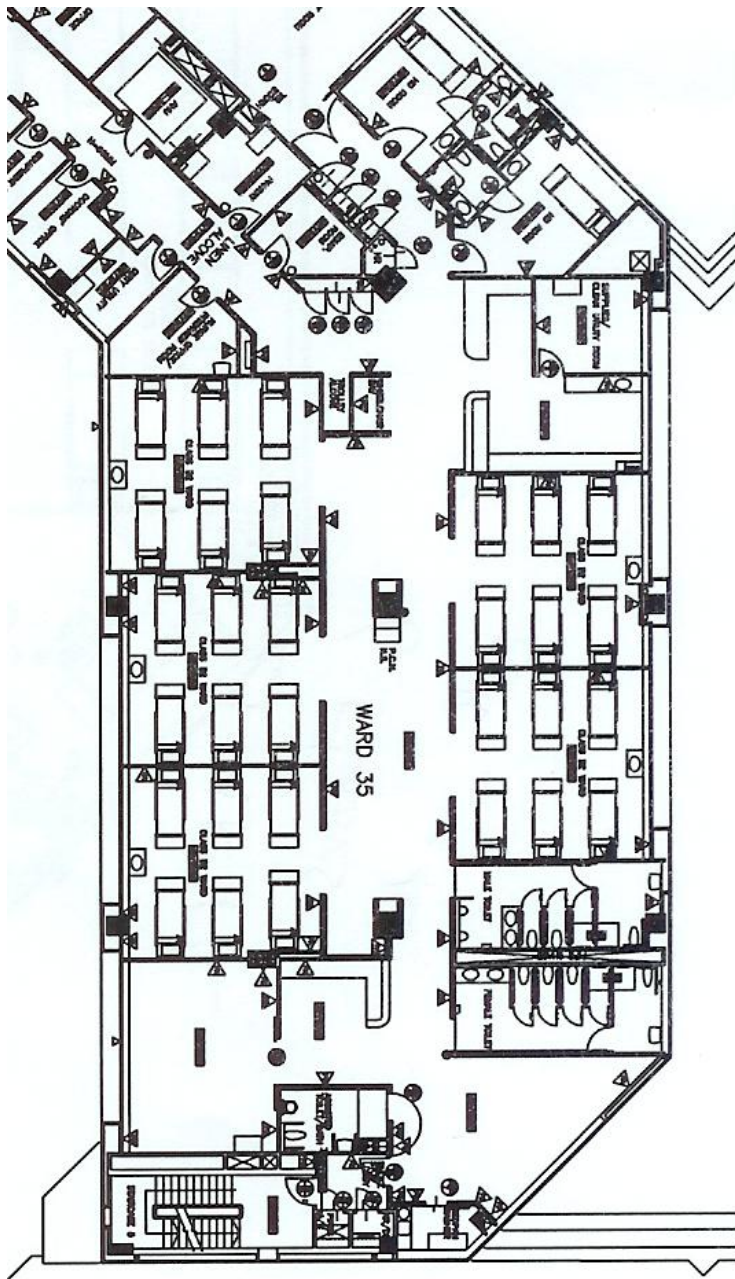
Floor Plan of CGH Naturally Ventilated Ward
